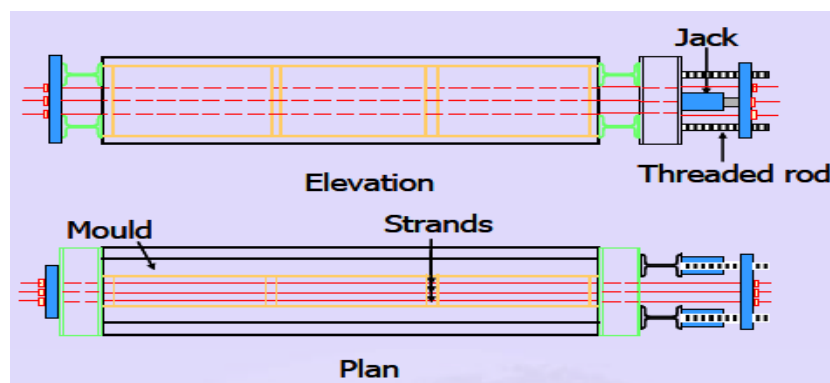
7 Cable profile of I girder prior to casting of concrete [4]
